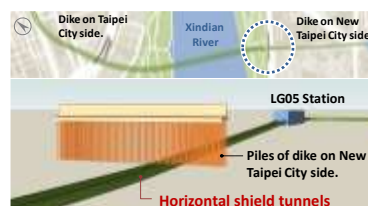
Horizontal shield tunnels pass underneath dike pile tips to avoid conflict in alternative plan
